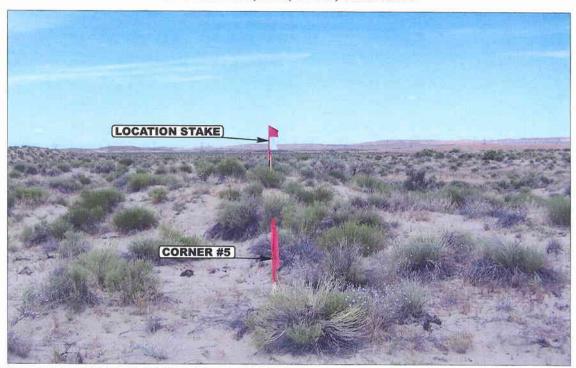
PHOTO: VIEW FROM CORNER #5 TO LOCATION STAKE
